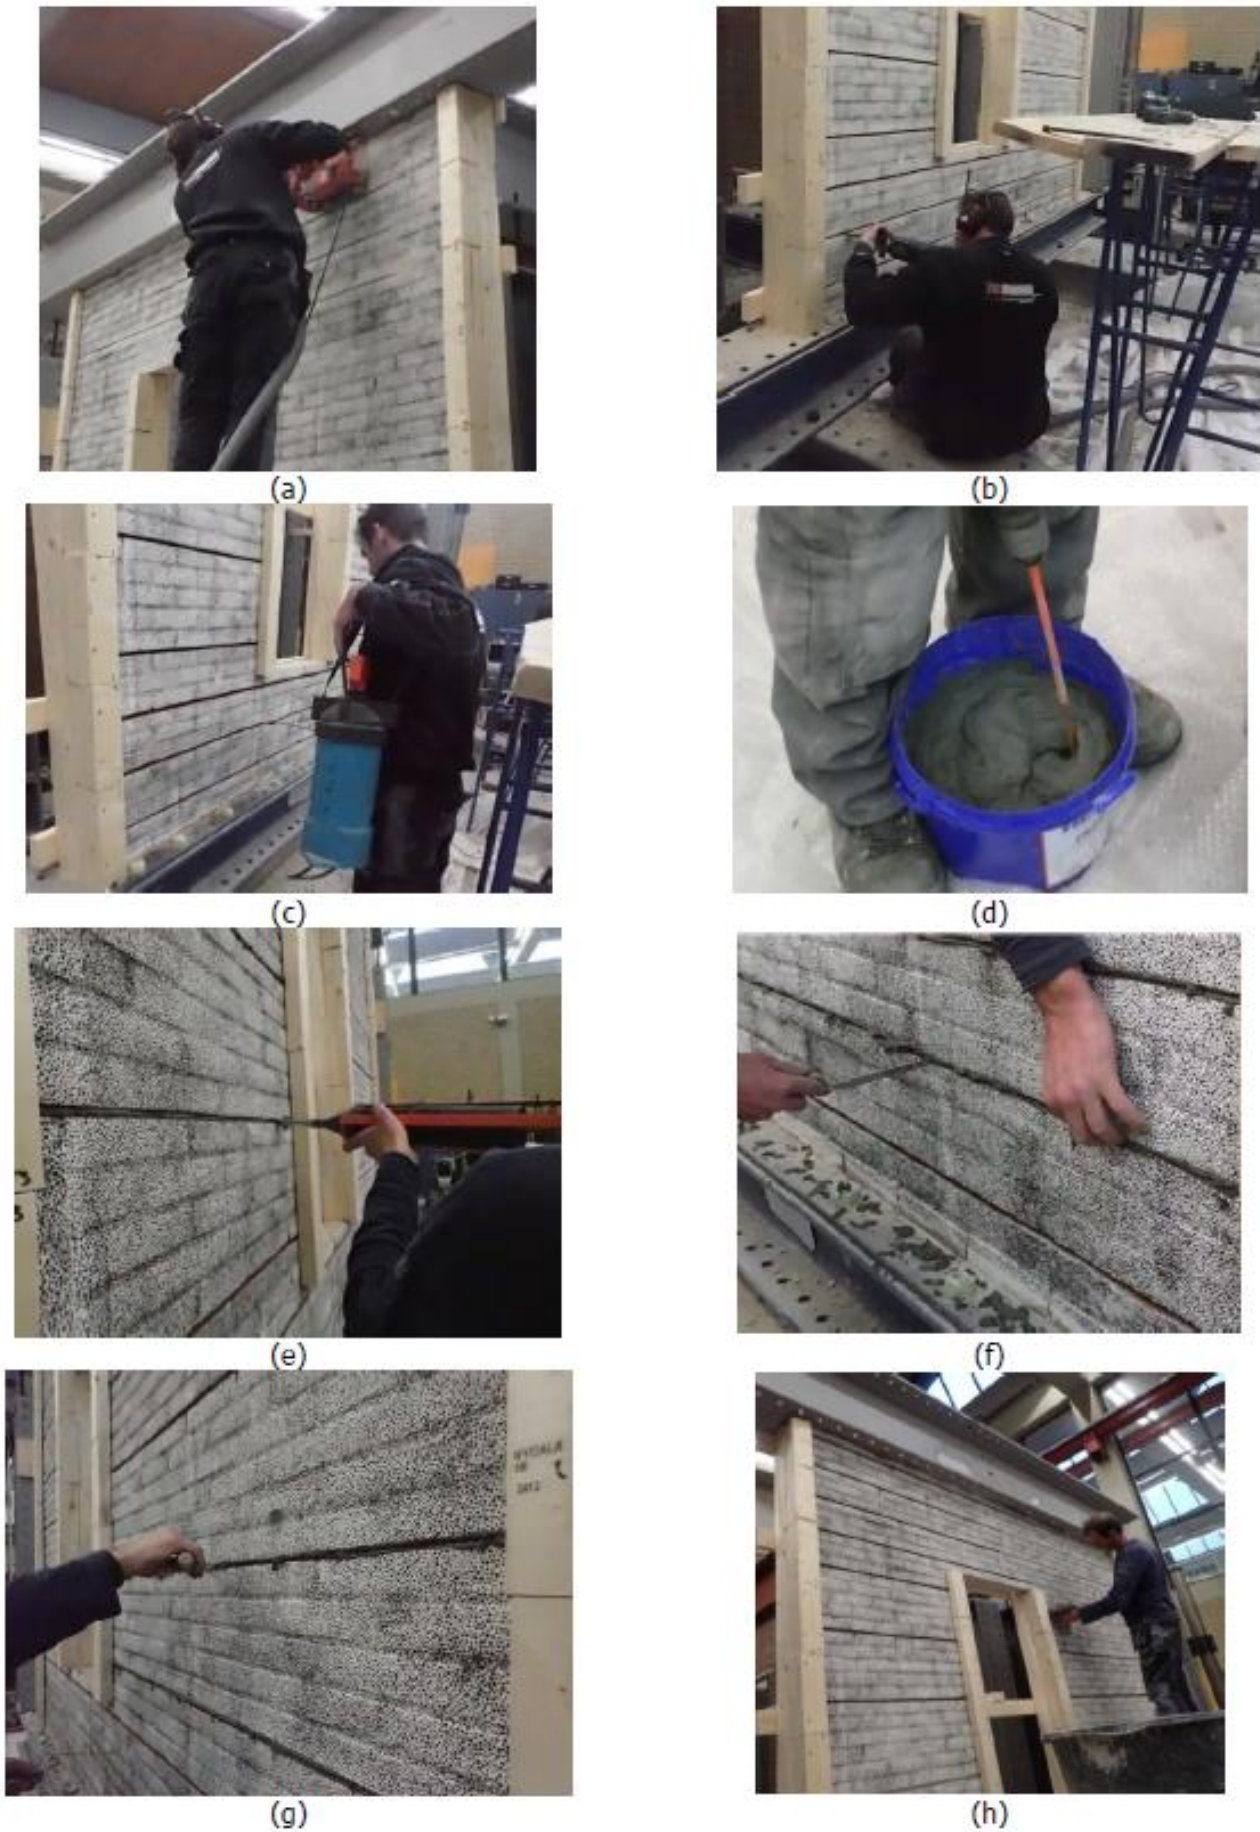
installation procedure of the bed joint reinforcement in a URM wall (Licciardello, Esposito, 2019)
